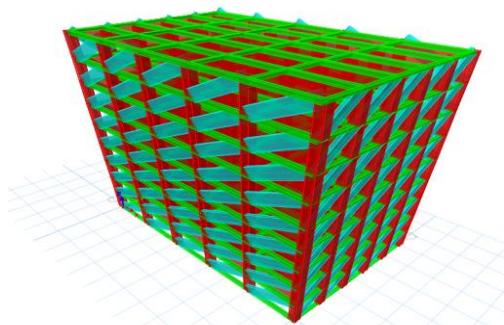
Three dimensional view of G+8 Building with infill(brick and AAC)
